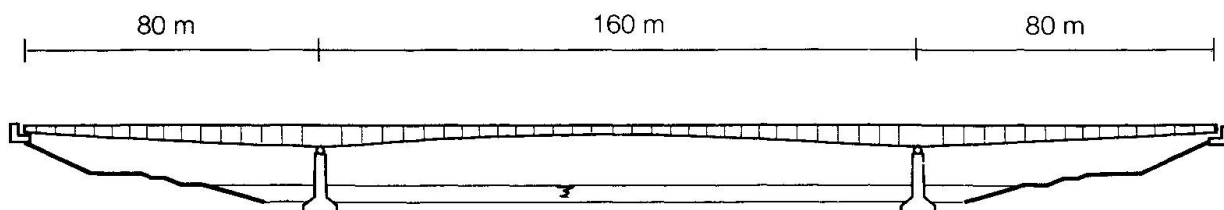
Longitudinal cross-section of the "Second Stichtse Bridge"
